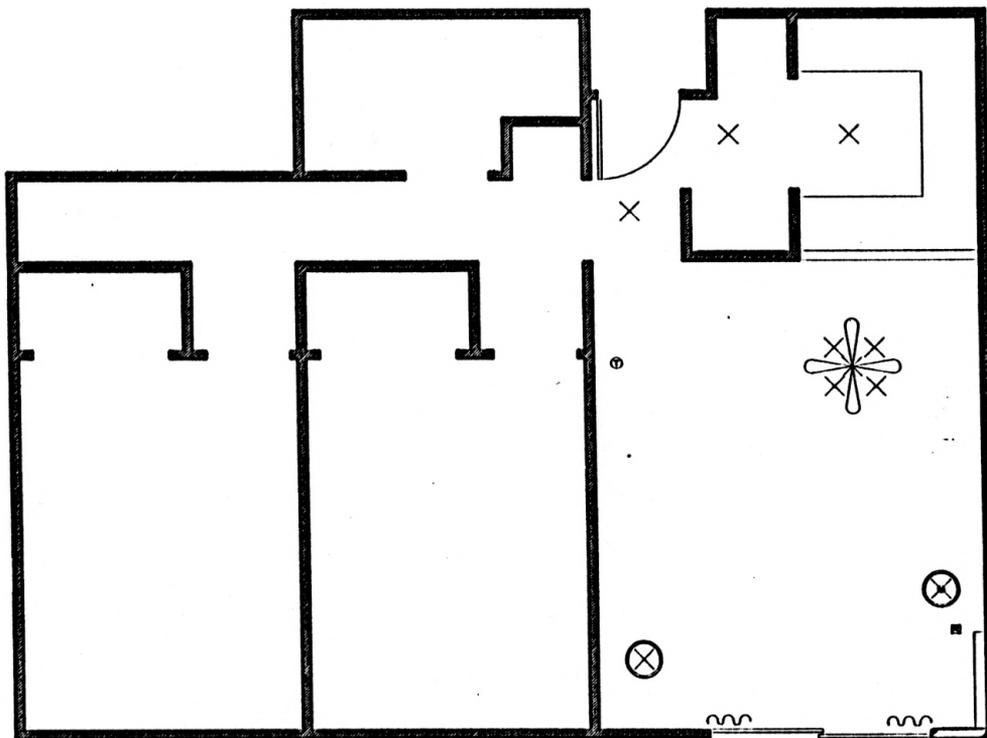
Plan of Independent Living Apartment - Site 1.
